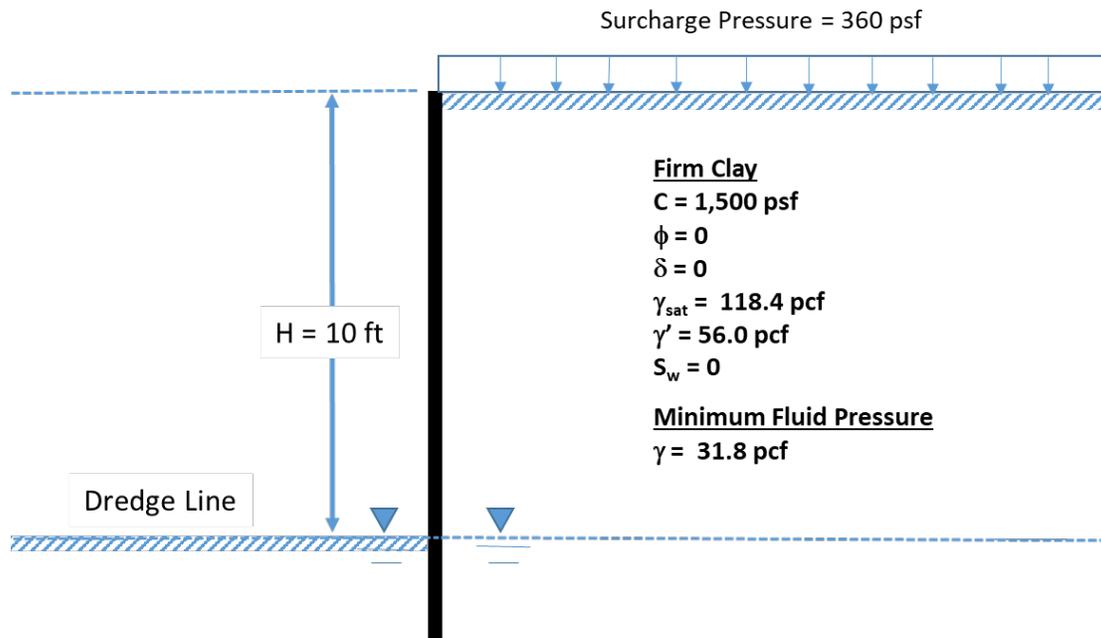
Case 3 Cantilevered sheet pile wall in firm clay.
